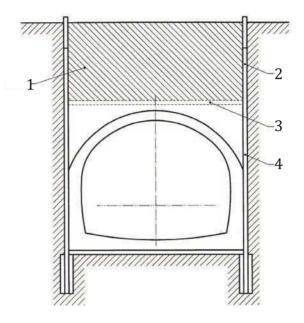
Concrete tunnel with reinforced concrete segmented arch
